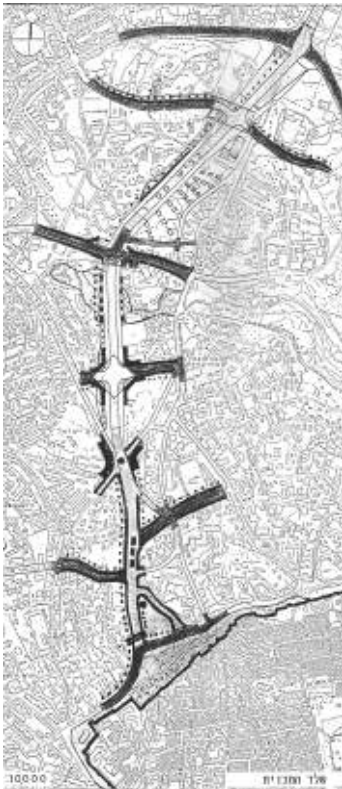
Right: the neighborhood Wall composed of a double wall and a promenade. Opposite: the bridge. Both were not constructed/executed. From Border Seam Line Plan: 2007.
